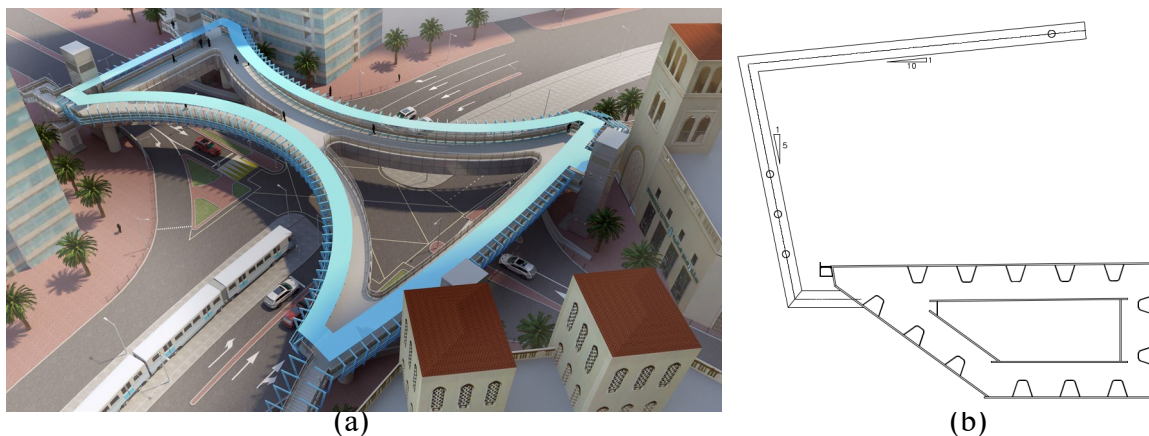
(a) Birds eye view of the bridge and (b) Typical cross-section of the girders
